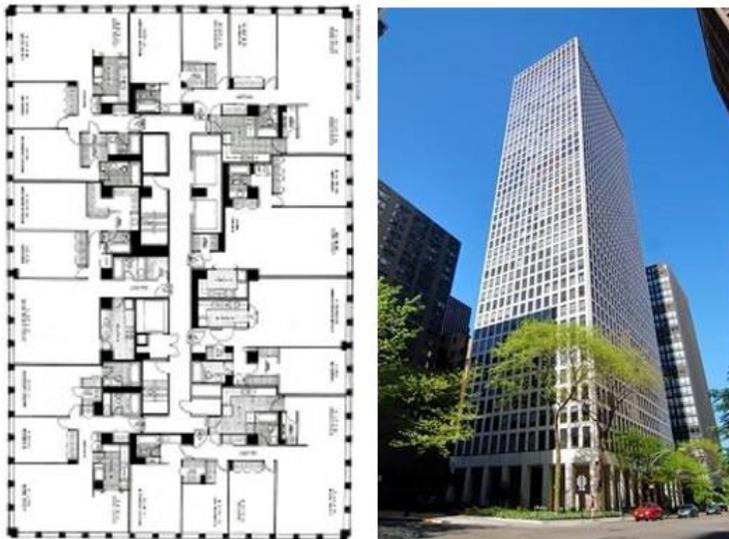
De Witt Chestnut Apartment Building in Chicago, F. Khan, Characteristic Floor Plan Showing Perimeter Column Arrangement (left), and De Witt Chestnut Apartment Building Constructed (right) [178, 137]
